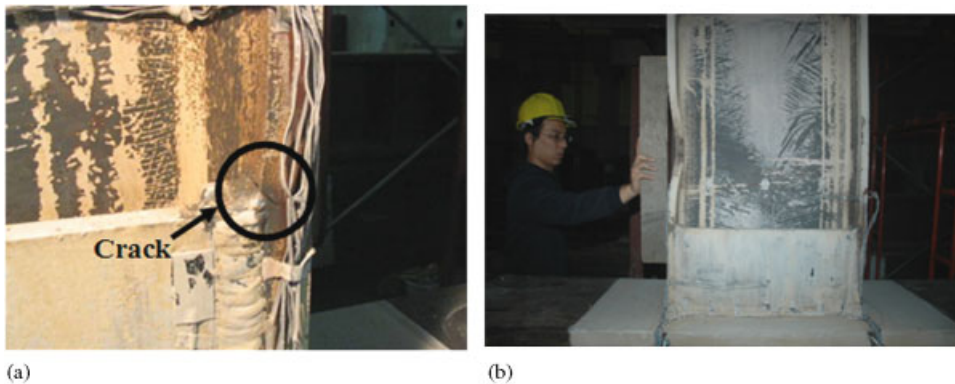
Specimen SP2 after the second test (4% drift): (a) flange crack at end of side plate and (b) beam buckling.
